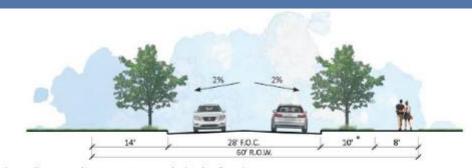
B: Urban Collector Roadway Design Option B (60' Right-of-Way)
